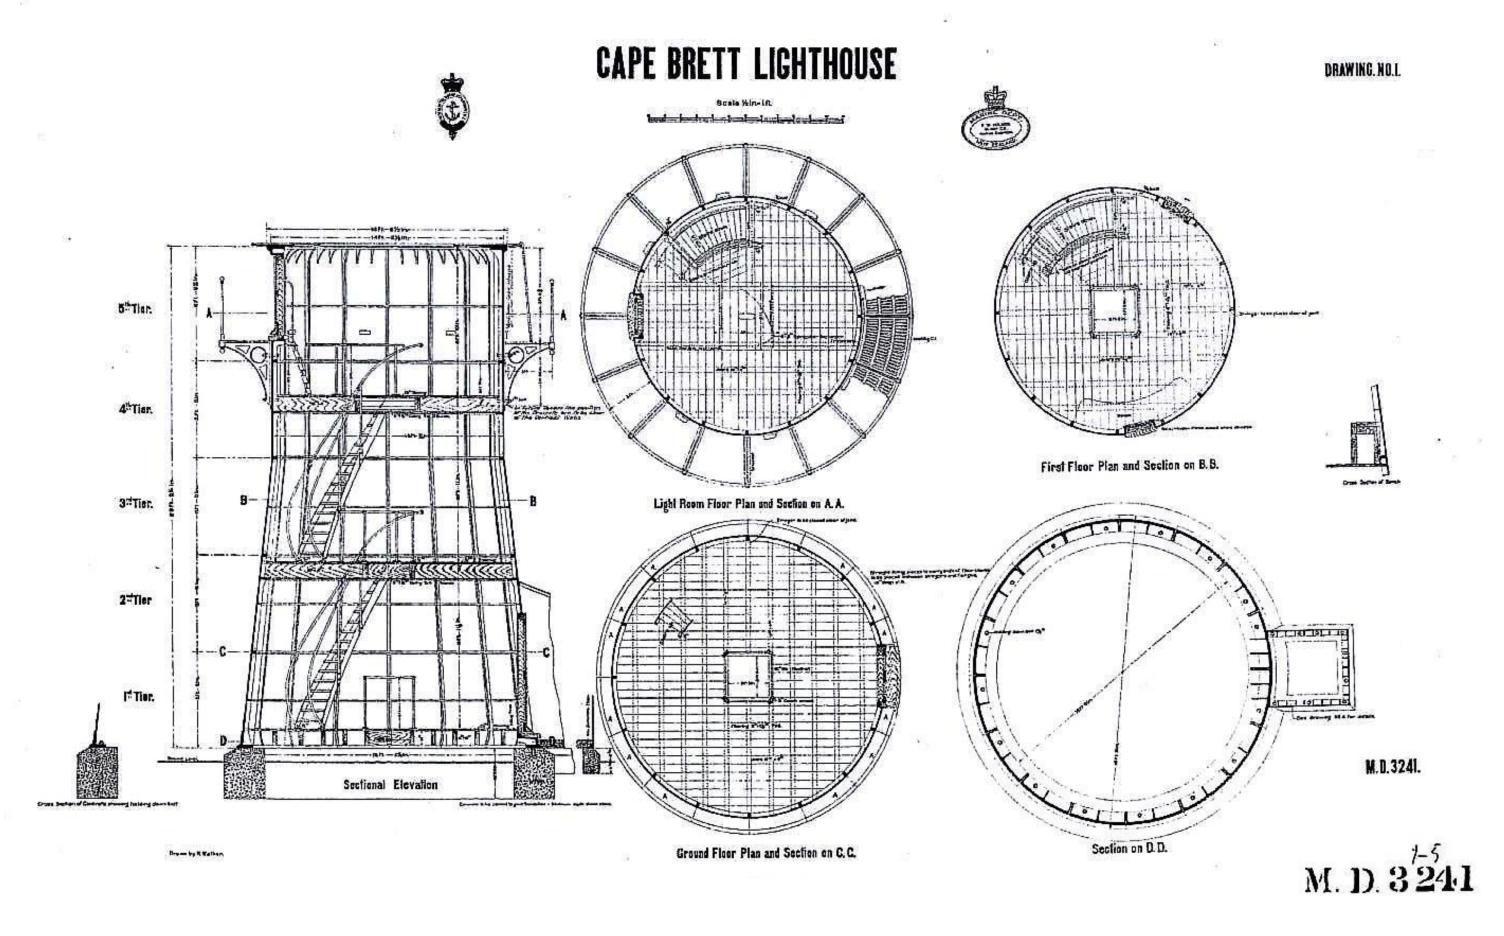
The architectural plans for the lighthouse –Drawing No 1.
